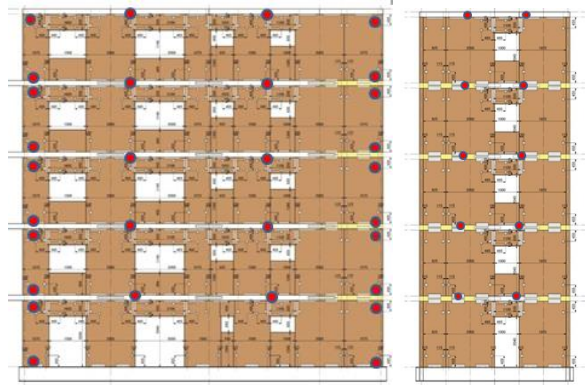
Schematics of 6-story wooden building. The height of the building was about 17m.
